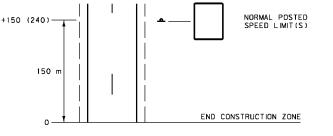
DETAILED DRAWING REFERENCE DWG. NO. STANDARD SPEC. 618-34 SECTION 618
